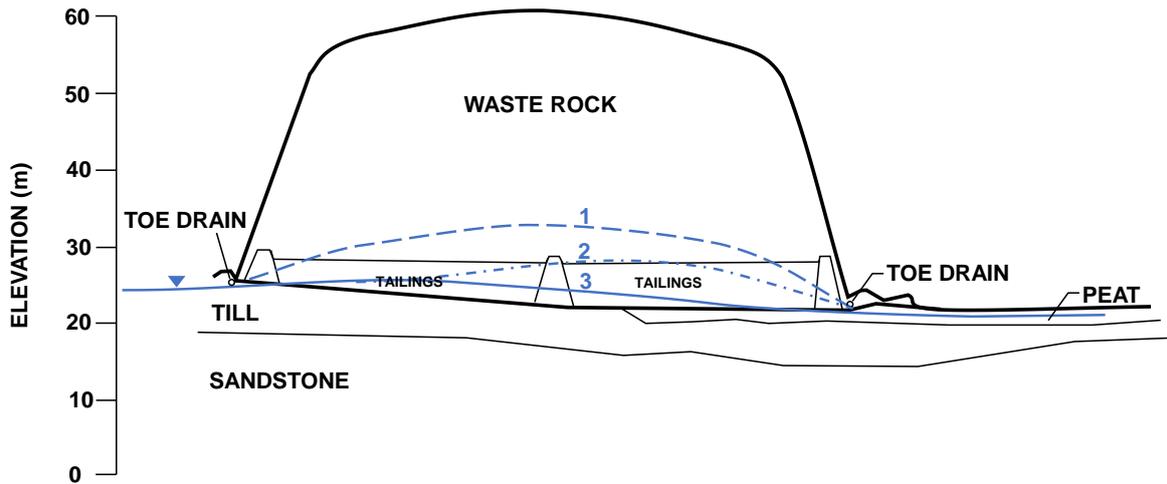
South-north cross-section of the Victoria Junction WRP with (a) Line 1, perched water elevation at time of cover system placement, (b) Line 2, current perched water elevation, and (c) Line 3, water mounding within base of pile following cessation of drain-down
